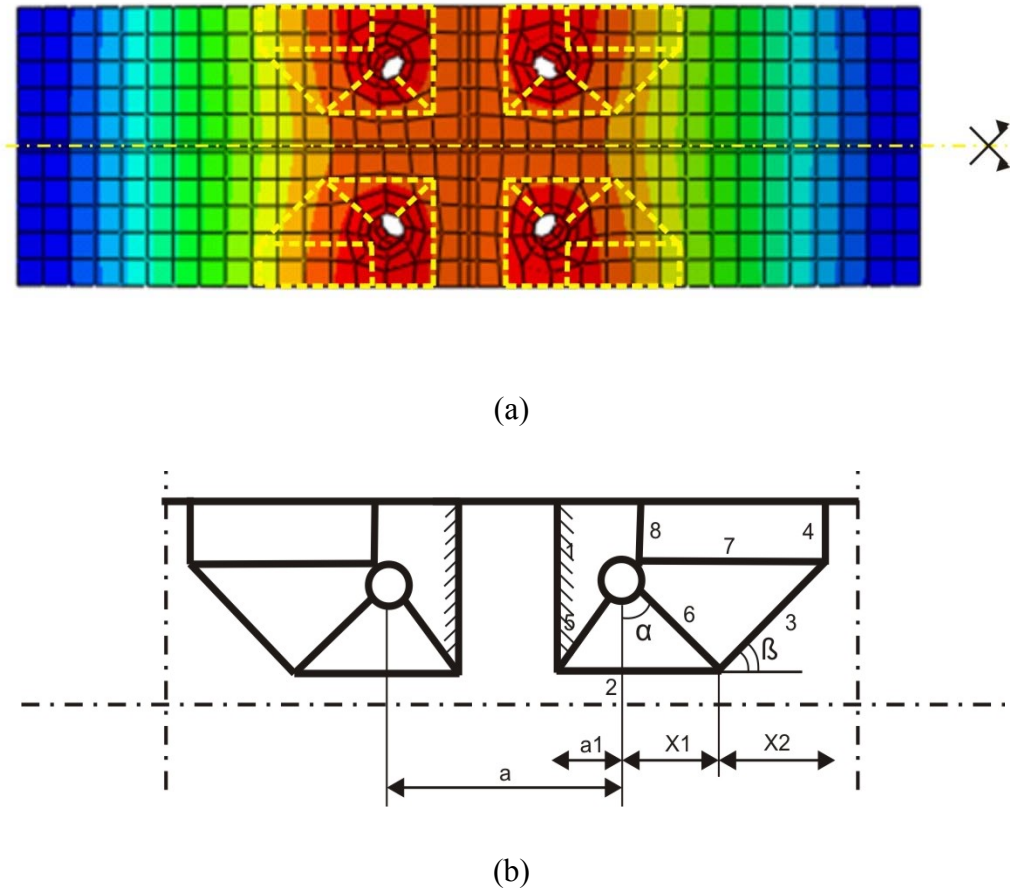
Yield line pattern for threaded bars and welded plates reinforced test.
